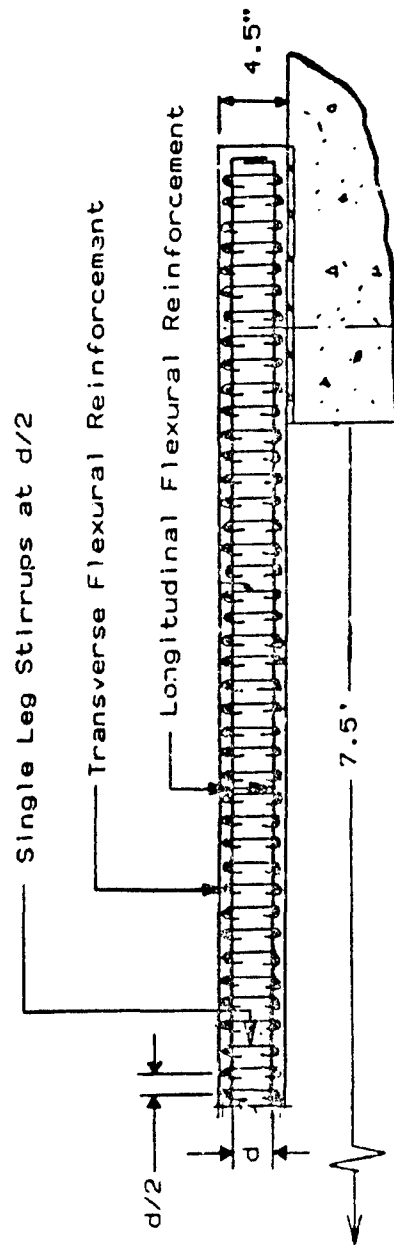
Typical Single Leg Stirrup Reinforcing (Slab Type I).
